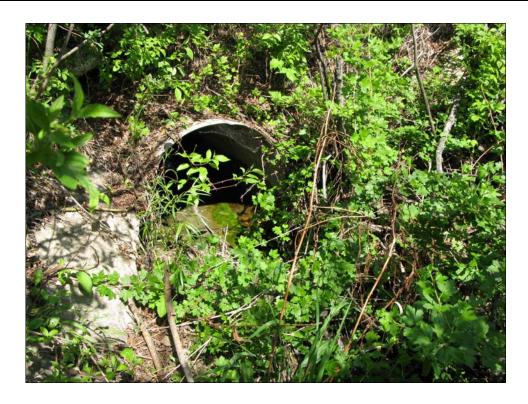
Likely location of Outfall #4 with overgrown vegetation.
